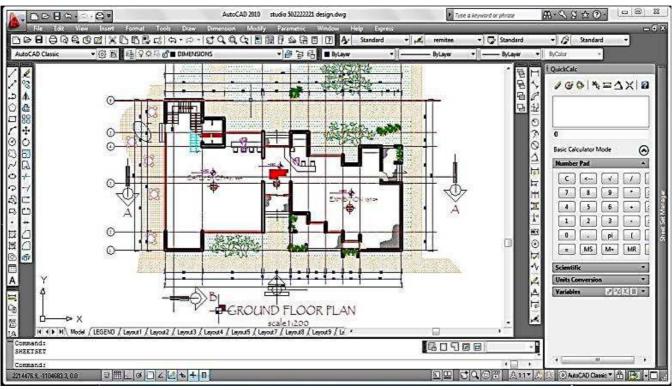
Typical 2D drawing (floor plan) done with AutoCAD 2010 interface (Source: by author).
